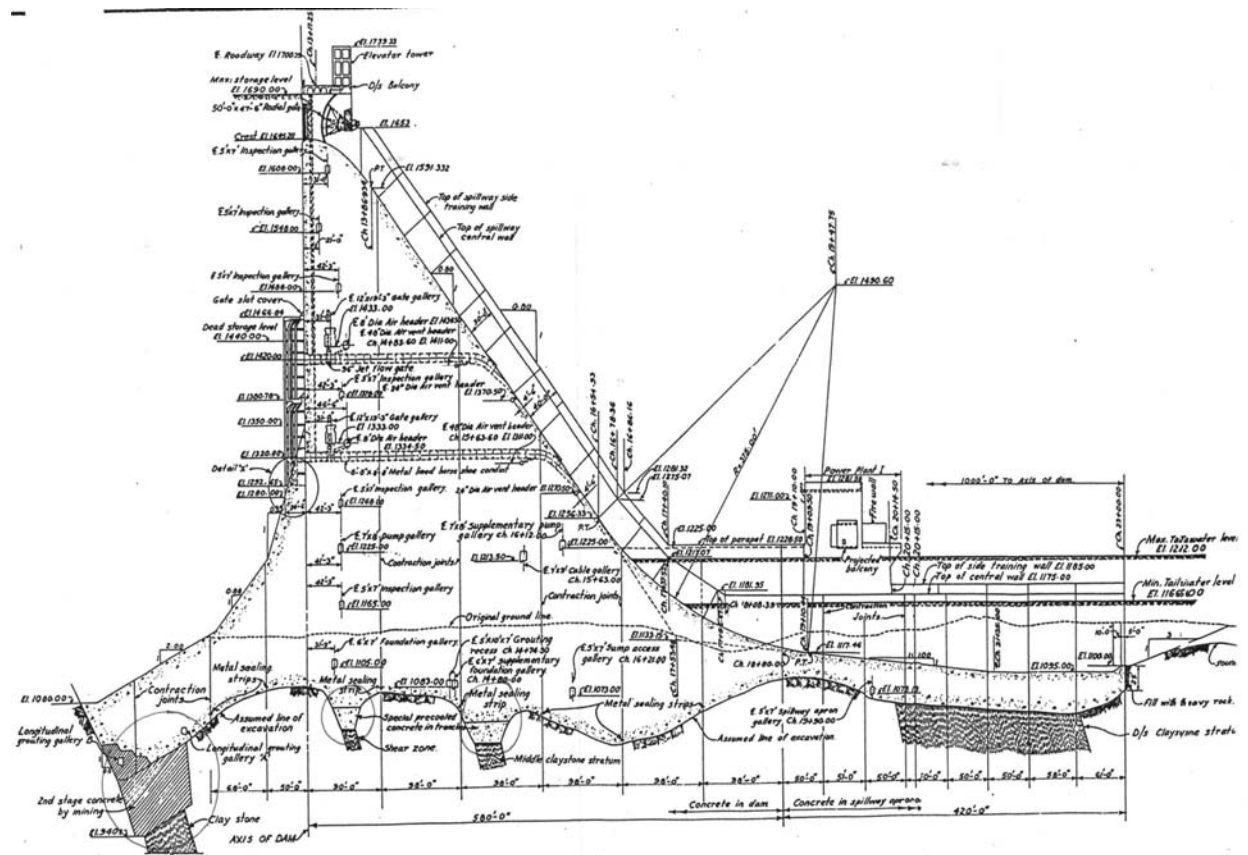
MAXIMUM SPILLWAY SECTION OF BHAKRA DAM SHOWING RIVER OUTLETS
